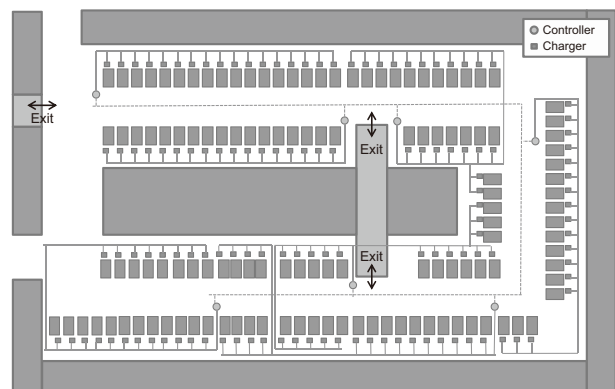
Layout of the EV charging controllers and chargers in the parking.
